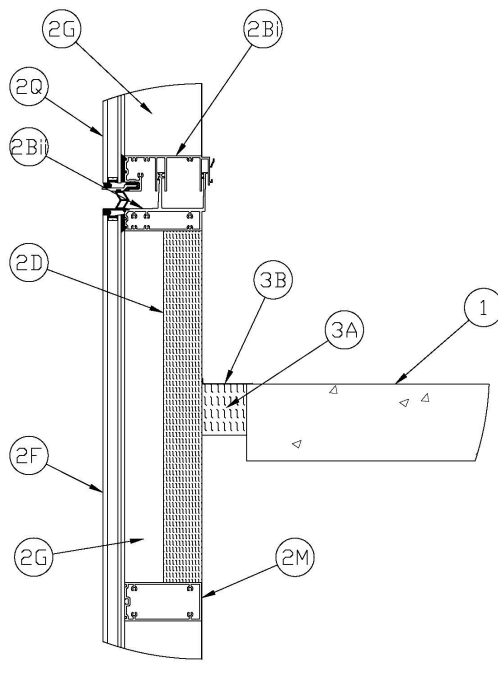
Base Detail Between Anchors (Kiss Transom)
